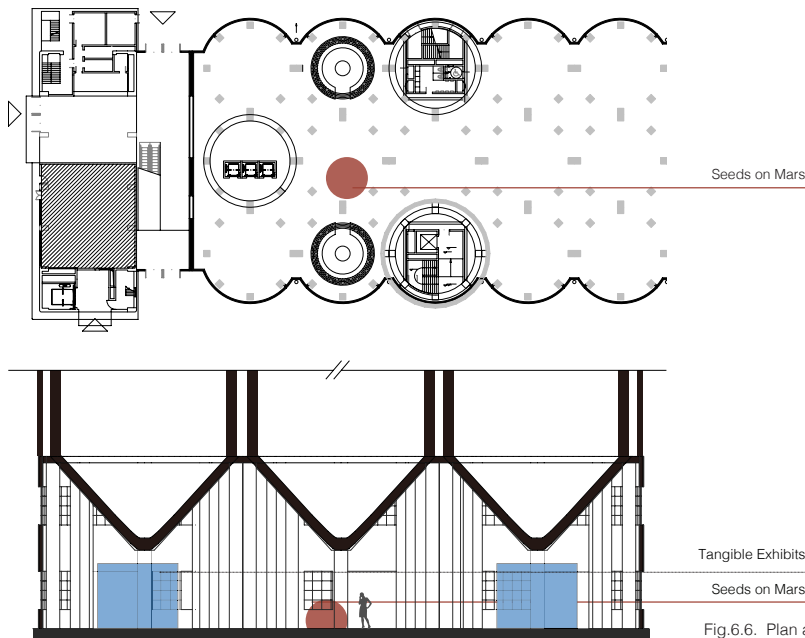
Plan and Section of Seeds on Mars in SUSAS
